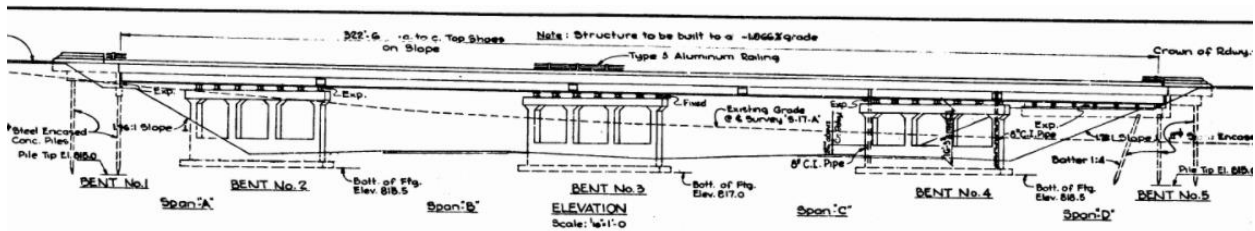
Elevation View of the Bridge (NBI 40300) (1960)
